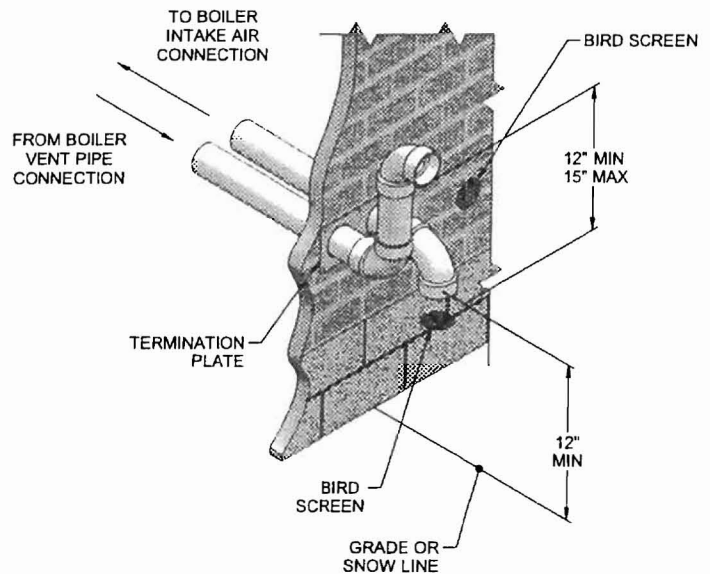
Alternate Sidewall Termination of Air and Vent if Space Allows
